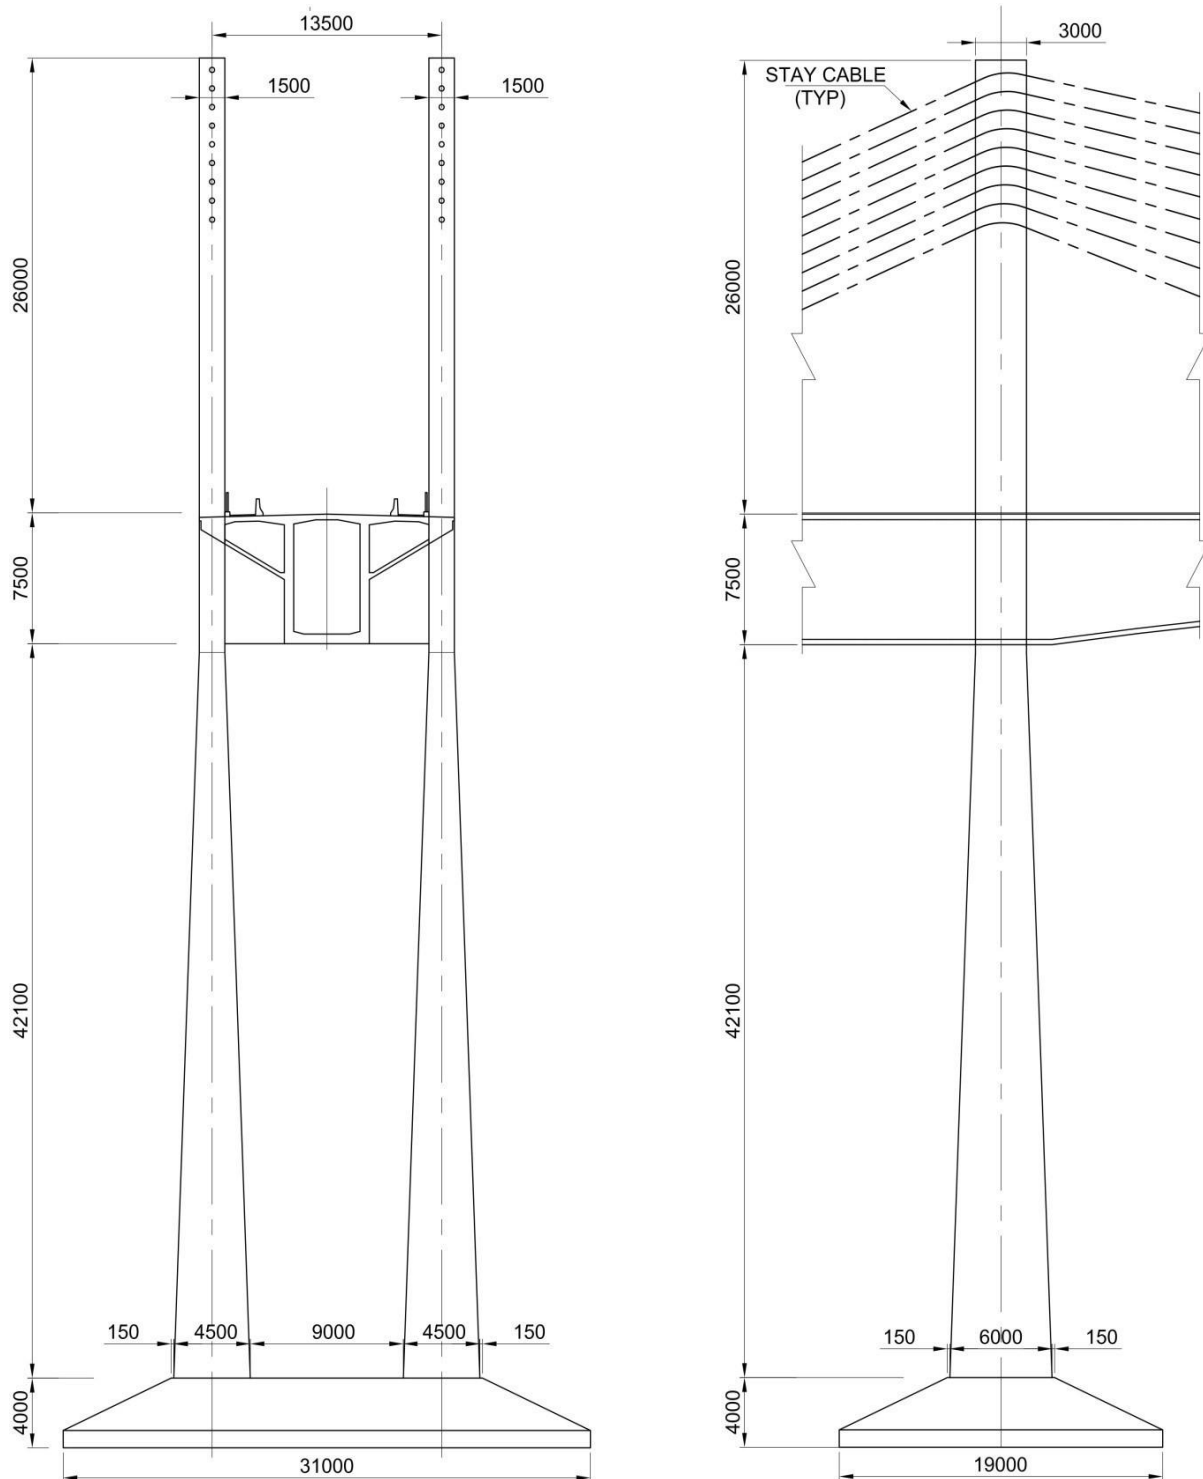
Front and side elevation of Pylon of Extradosed Bridge over Siang River.
